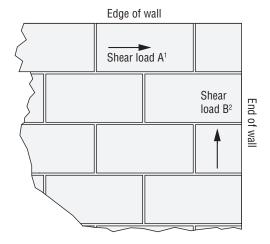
Direction of Shear Load in Relation to Edge and End of Wall
